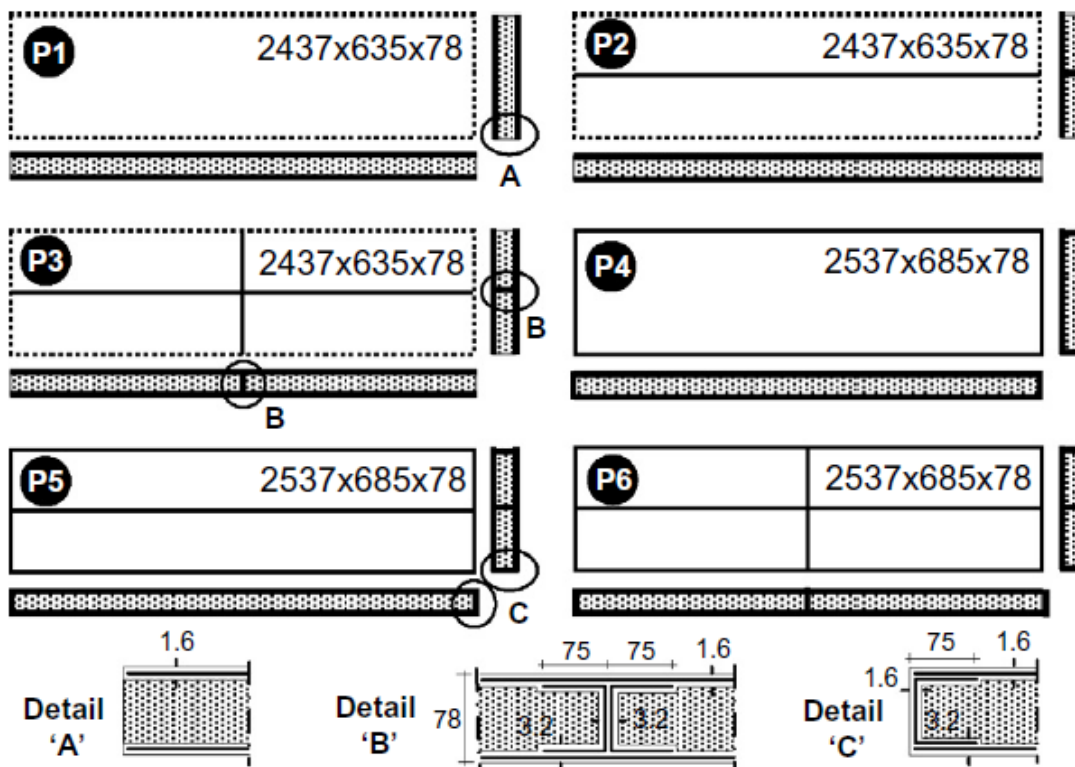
Schematic of all stiffener configurations tested (*P1 – P5*), along with any associated detailing, (Fam & Sharaf, 2010).
